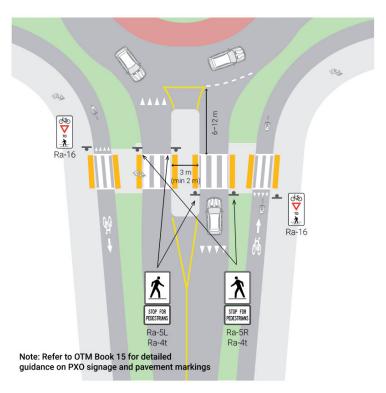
Single-Lane Roundabout, PXO Crossing Treatment
